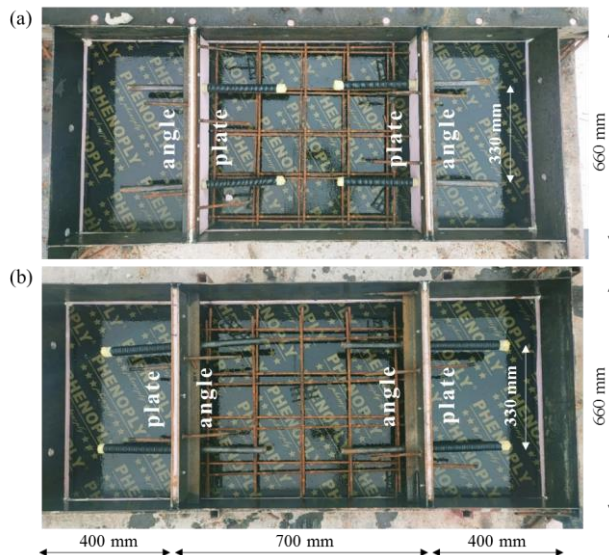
Specimen formwork before concrete casting: (a) specimen R1, (b) specimen R2
